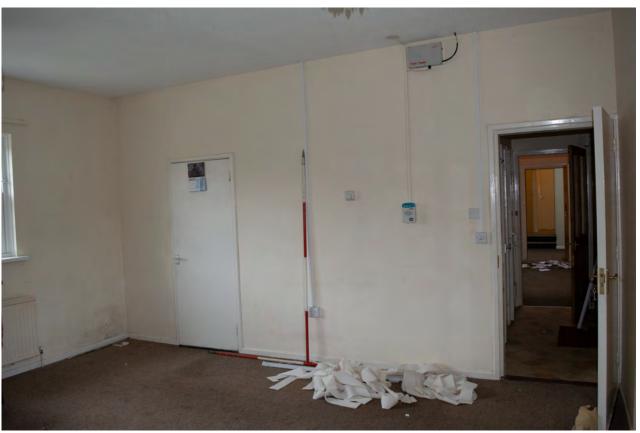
South-east wall of living room in flat 4. 2x2m scale.
